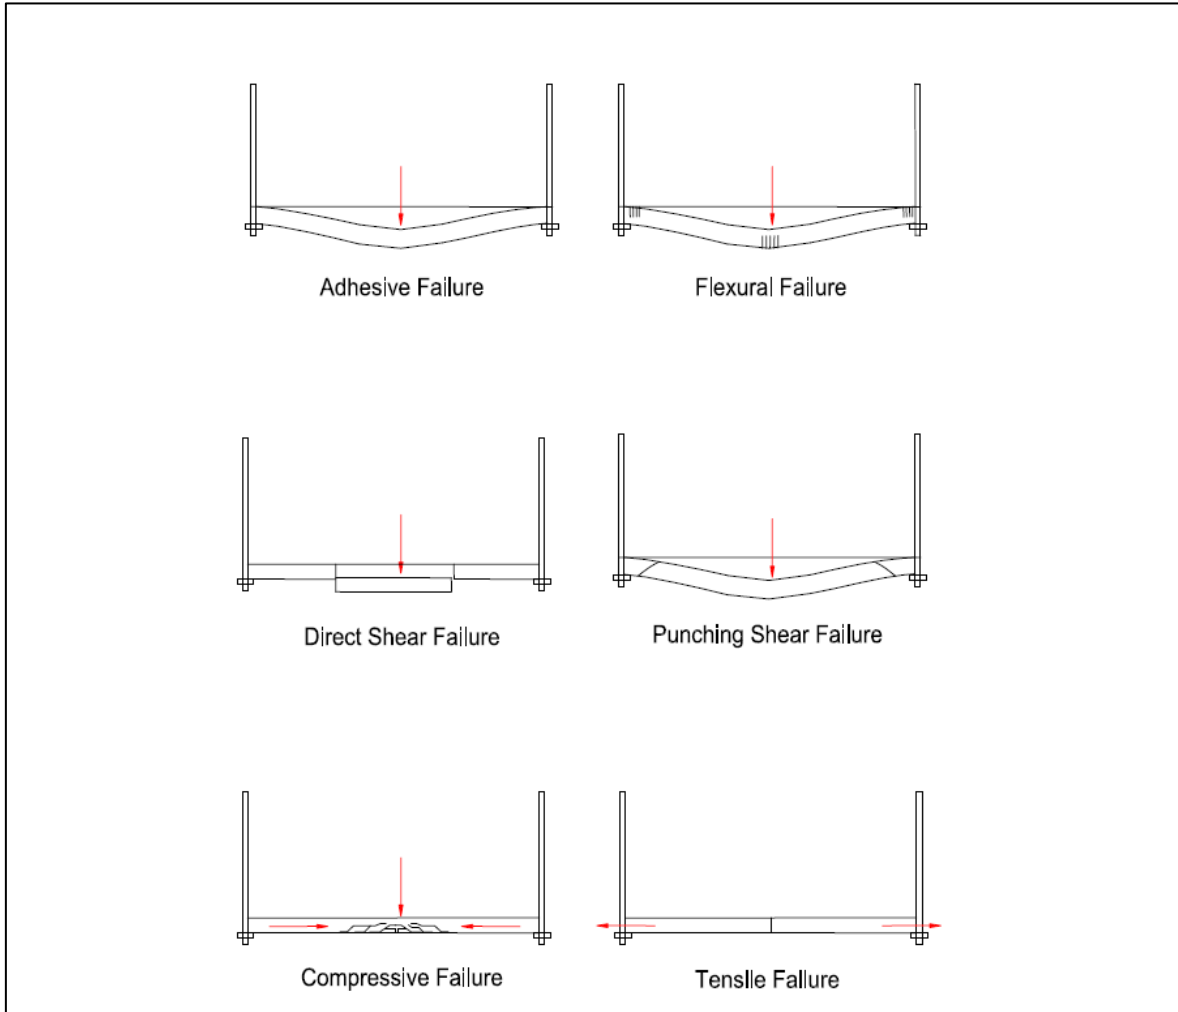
Shotcrete failure modes (Barrett and McCreath, 1995).
